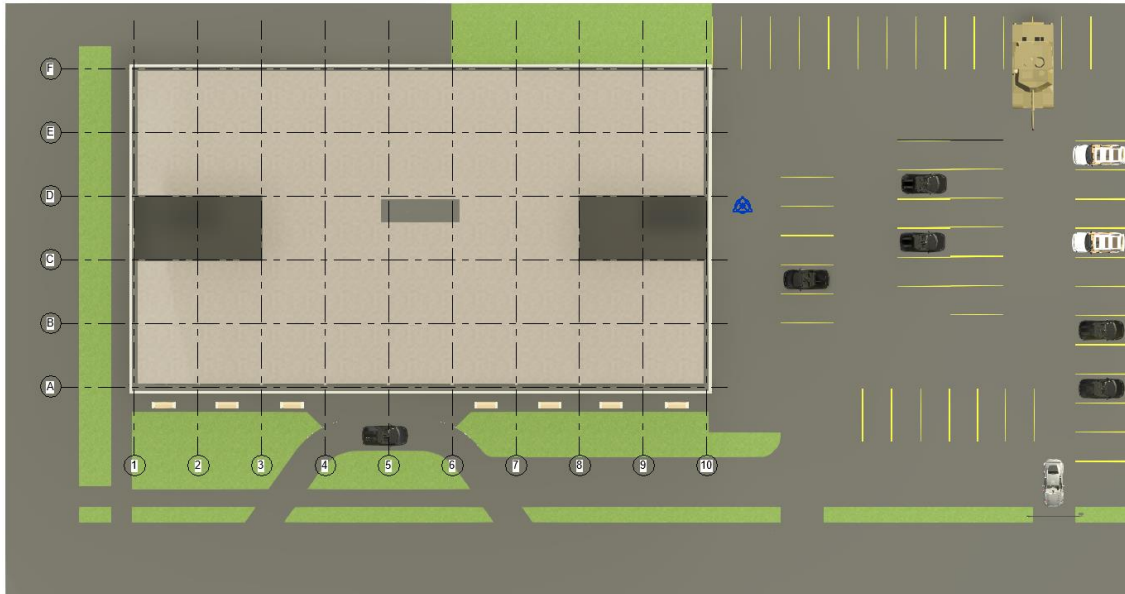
Emergency exit plan 2-15 floor2.1.7. Parking and site layoutFigure 10. Parking and site layout2.1.8 Concrete mixture
